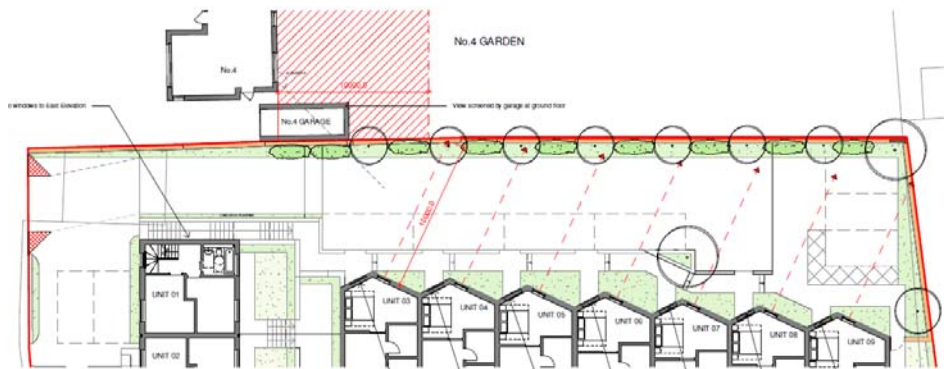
Plan showing protected area of neighbour's garden (red hatching) and angled windows in proposal
